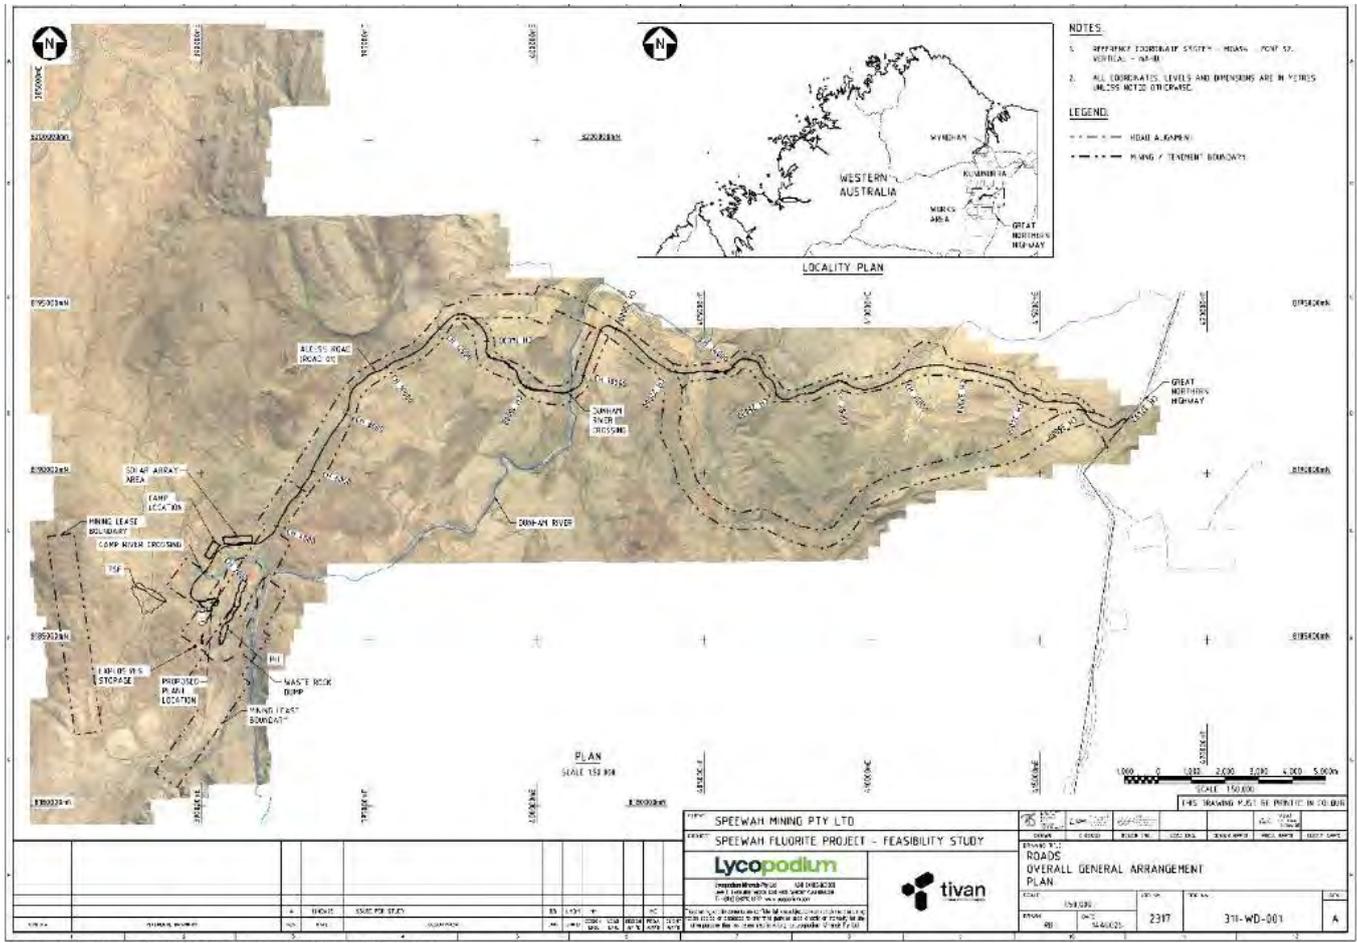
Site plan showing existing exploration tracks and proposed access road alignment produced by Lycopodium.
